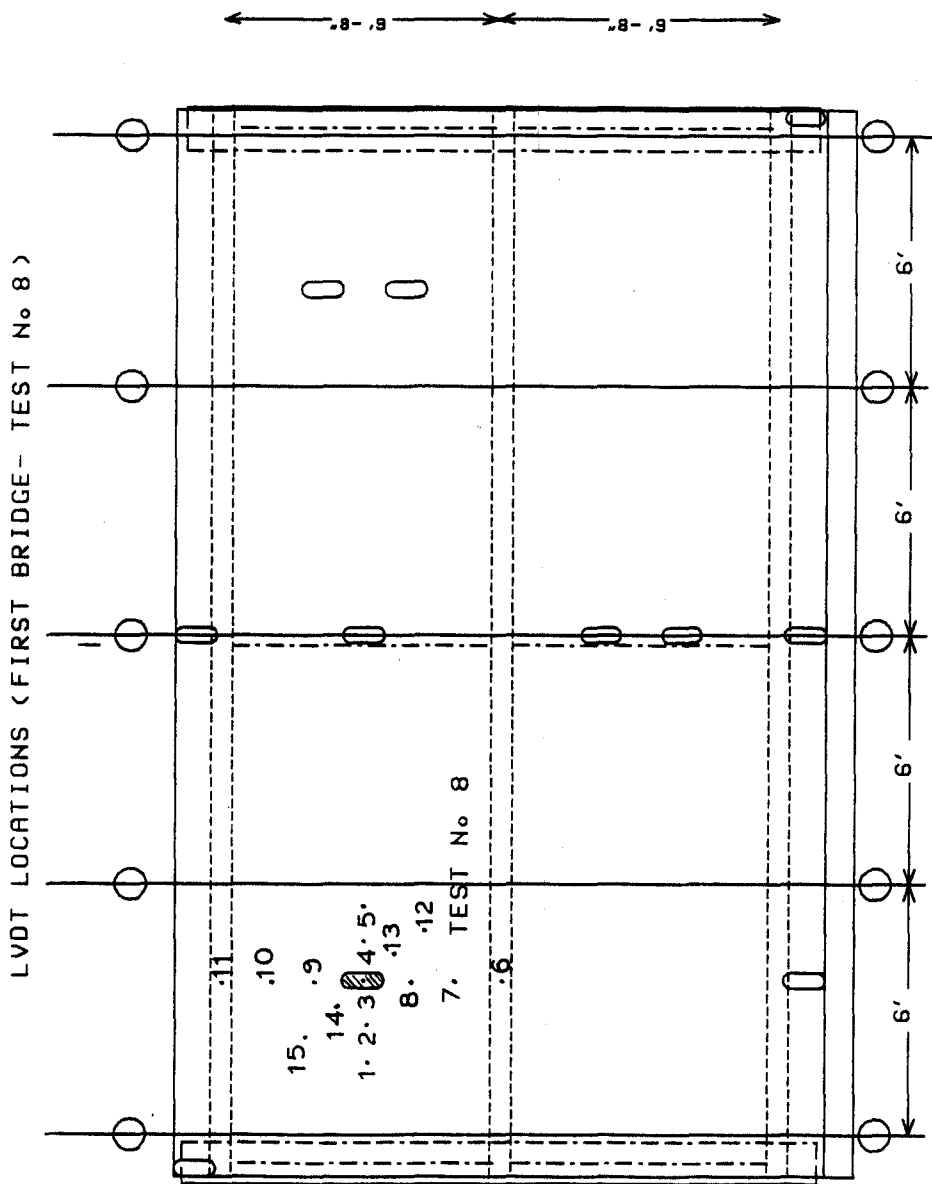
LVDT Locations (First Bridge - Test No. 8)
